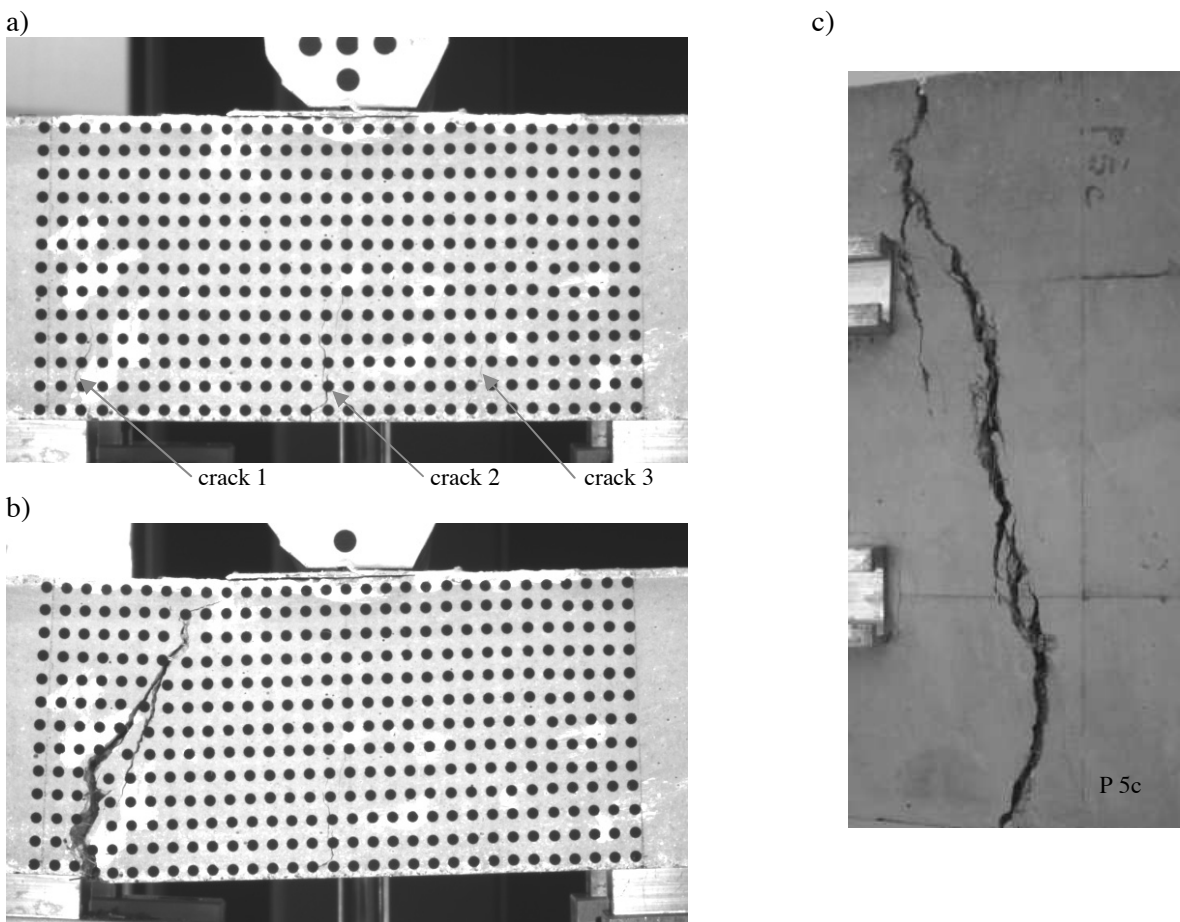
Cracking of the beam: a) cracks at P_{max} and b) cracks at failure, observed by photogrammetry analysis; c) crack pattern on tensile beam side.
